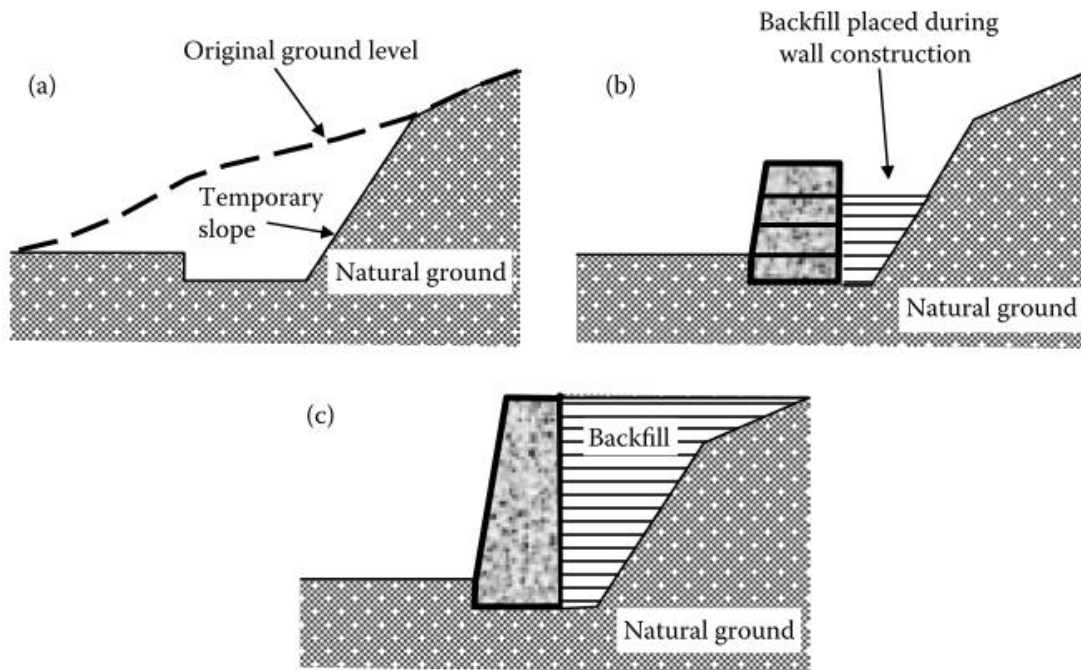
1. Gravity retaining wall construction. a) Excavation b) wall construction c) finalized gravity wall
